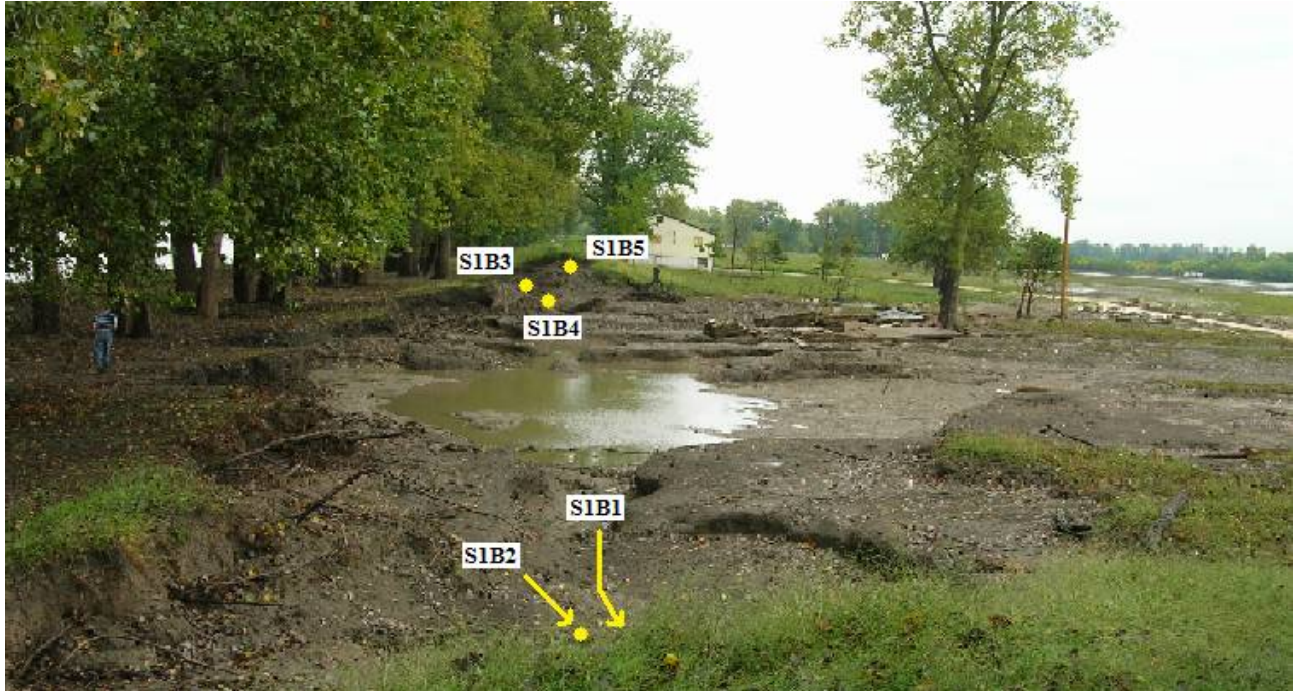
Boring locations Winfield – Pin Oak breach looking south.
